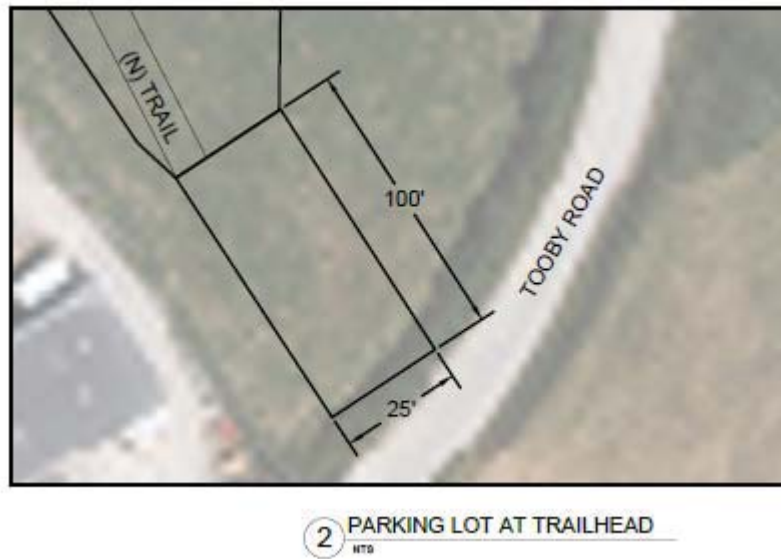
Location and dimensions of Area 2 staging area at the end of Tooby Road, which will become the new trail head parking lot and access point at the end of construction.
